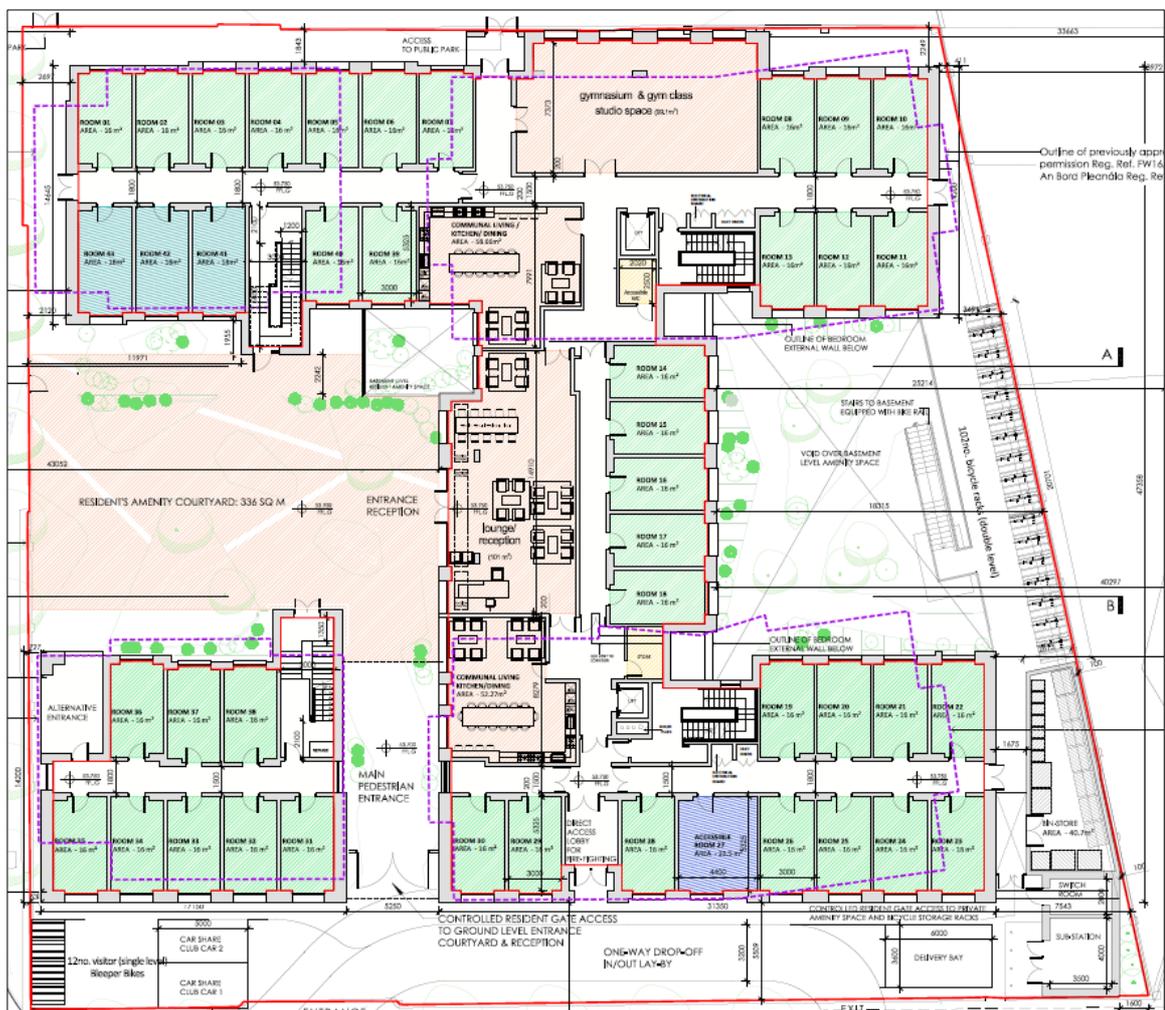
Site Plan/Ground Floor Plan Showing the Proposed Scheme Generally Within the Footprint of the Extant Permission [Purple Dashed Line]
